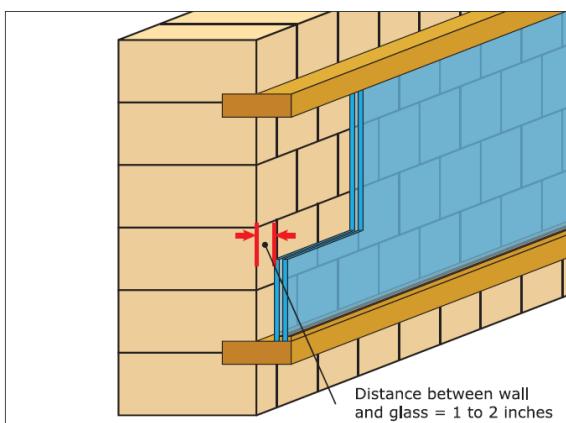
Double Glazed frame in a solar wall [8] (color scheme)
